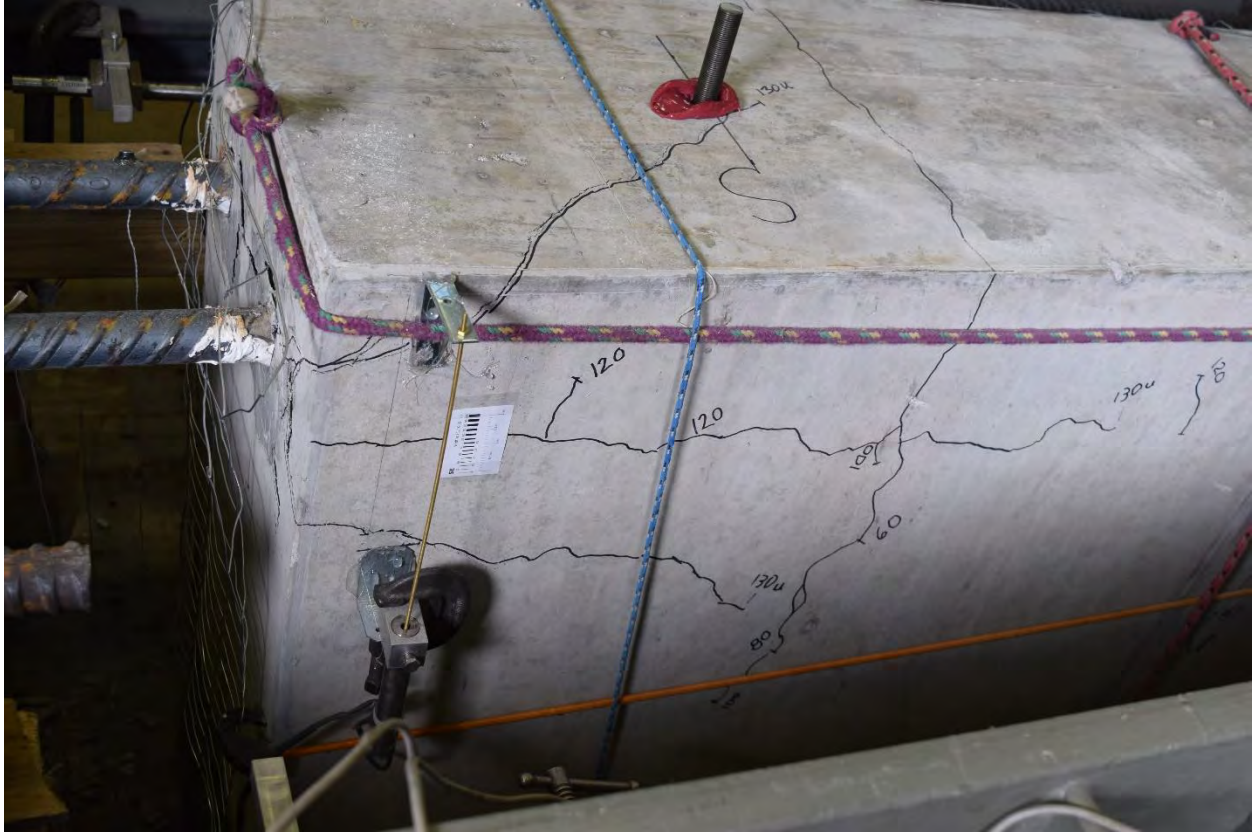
Test Photo Specimen D5, SE corner, 108 kips
